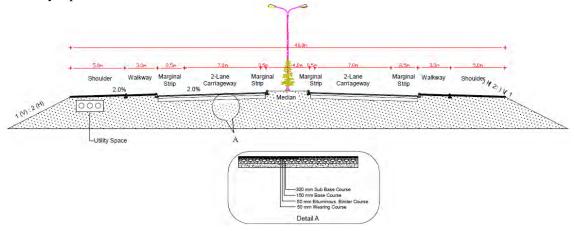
(5)-1 Standard Cross-Section of the Access Road
